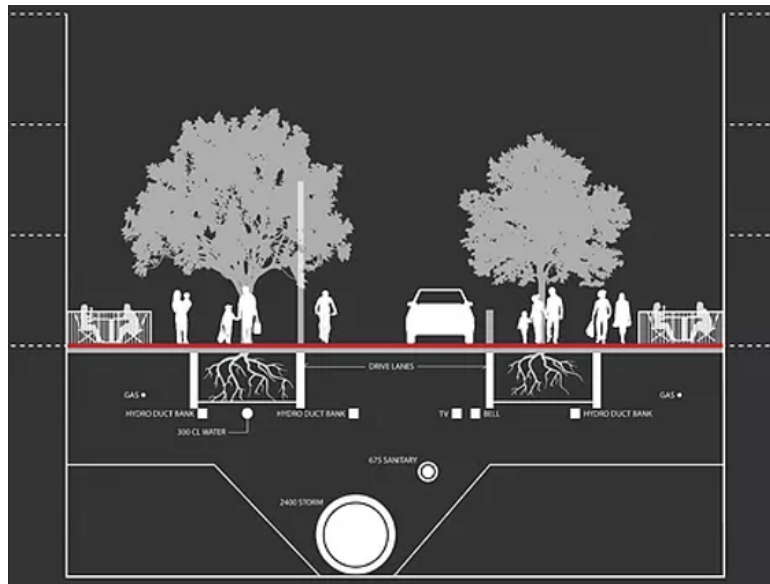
Cross section of curbsless street design and underground infrastructure (Dundas Place, 2019)
